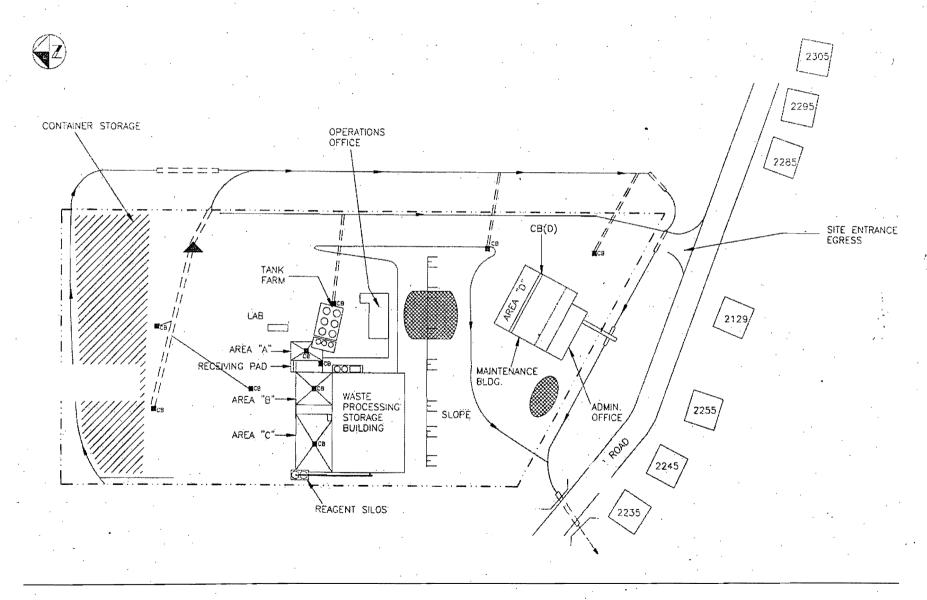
TYPICAL SITE LAYOUT OF WASTE TRANSFER FACILITY
